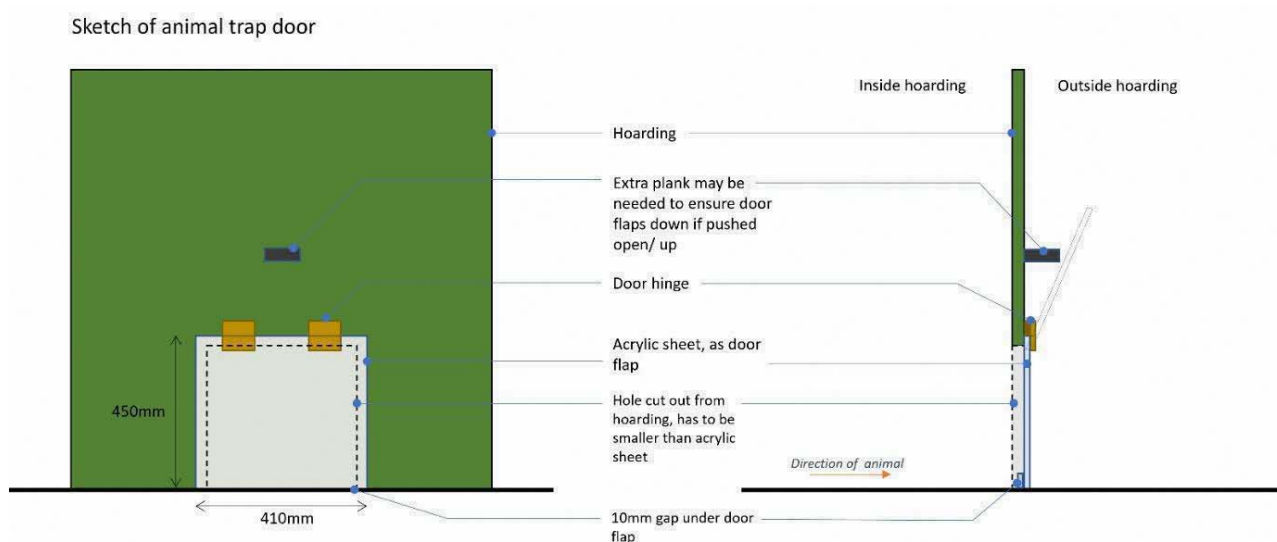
Sketch of Proposed One-way Trapdoor Wildlife Exit
